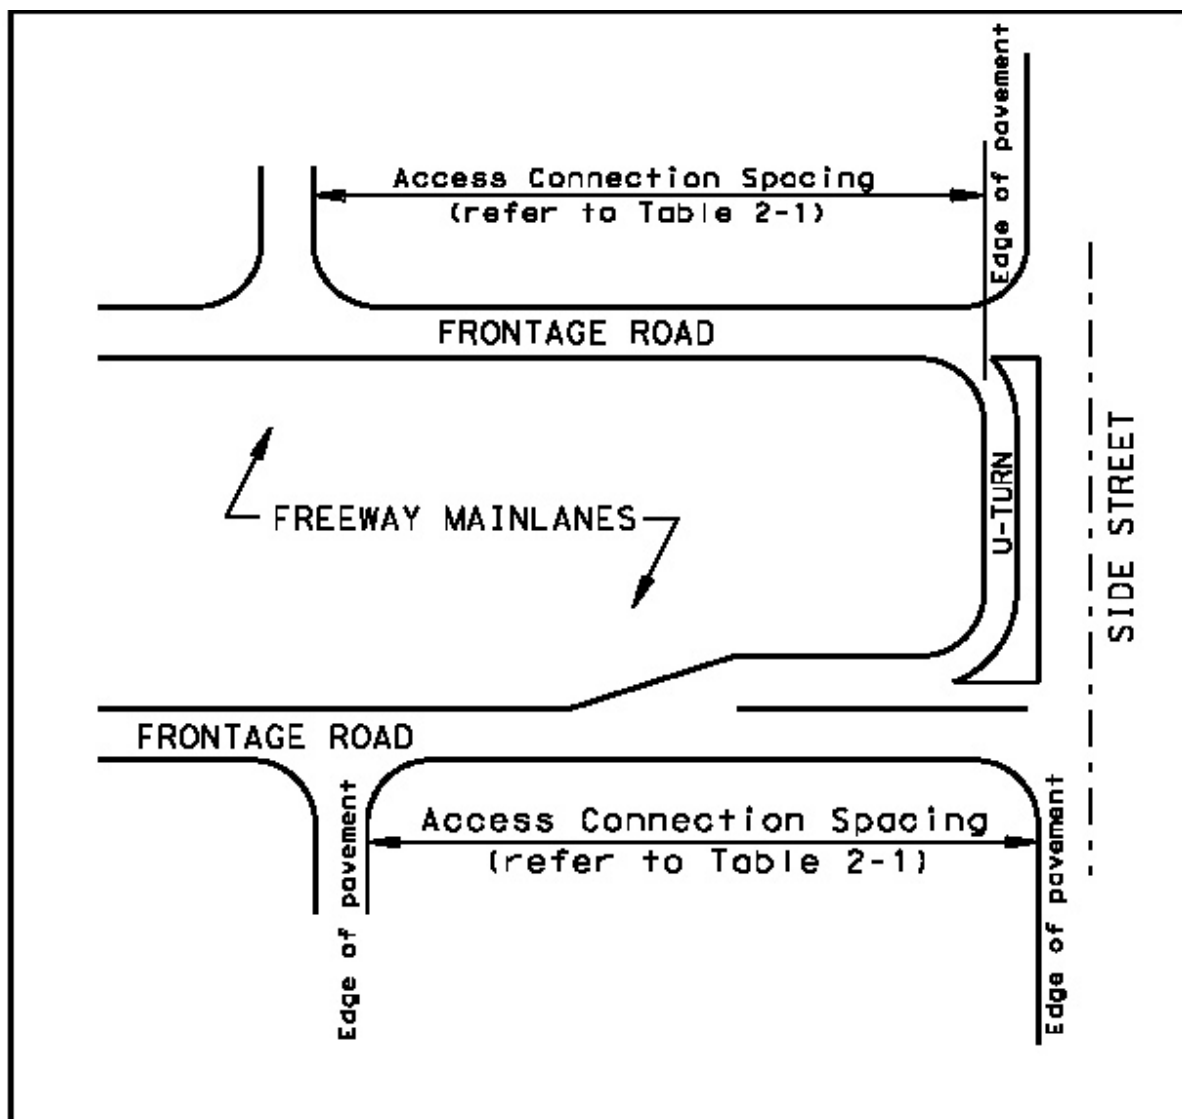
Frontage Road U-Turn Spacing Diagram
